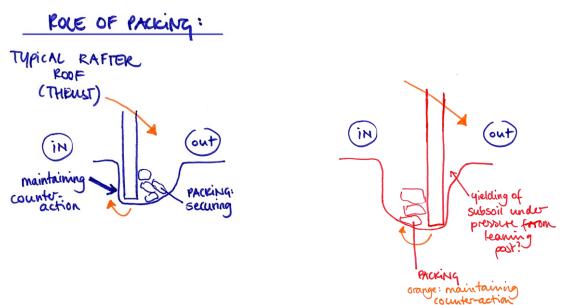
Sketch section of a posthole. Drawings T Romankiewicz.
